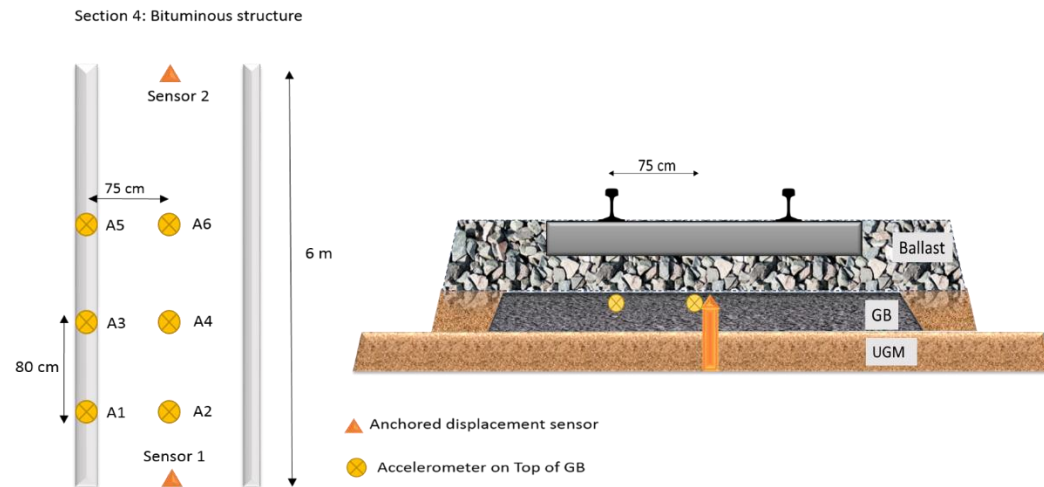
Section 4: instrumentation layout for accelerometers and displacement sensors
